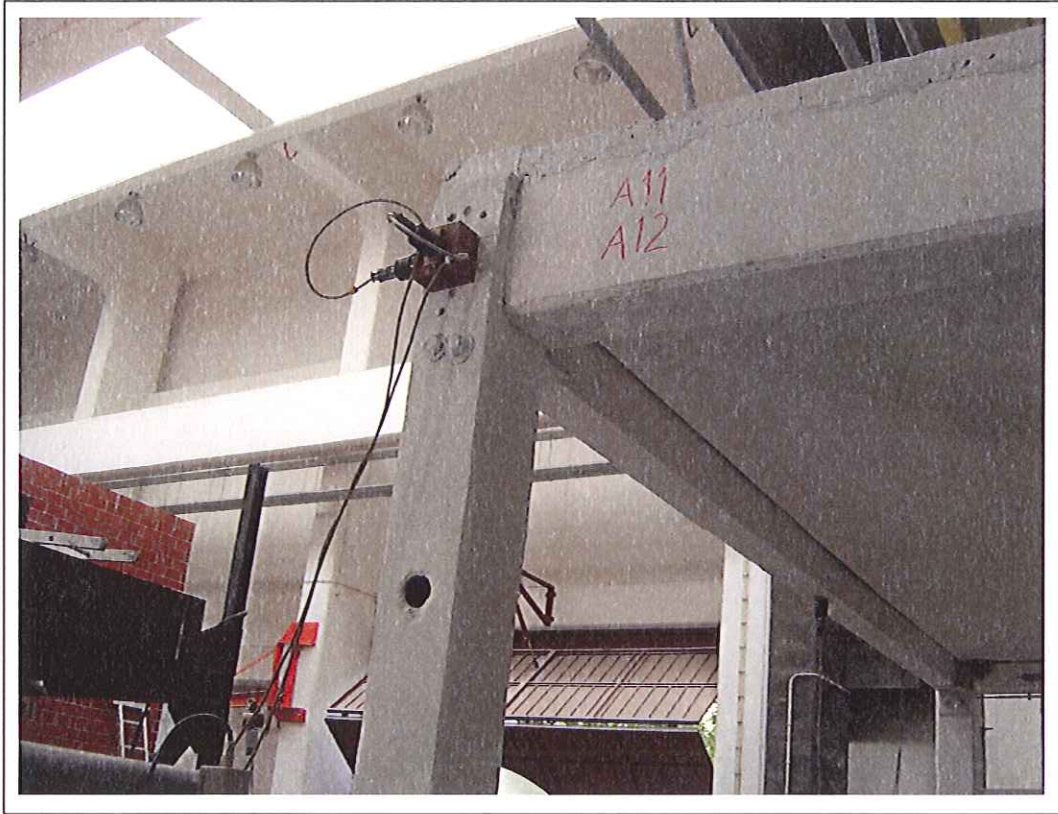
Detail of the beam-column connection after stage 02 (J10-Long.)
